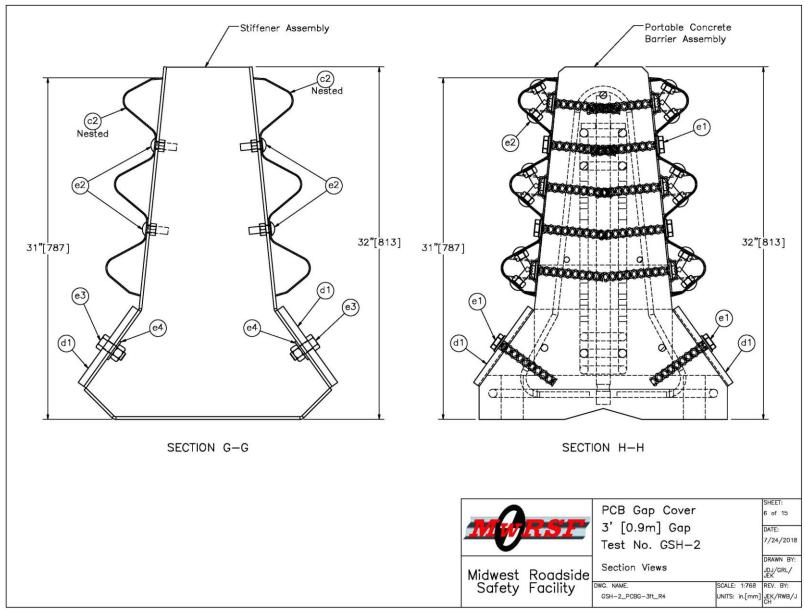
Section G-G and Section H-H Views, Test No. GSH-2
